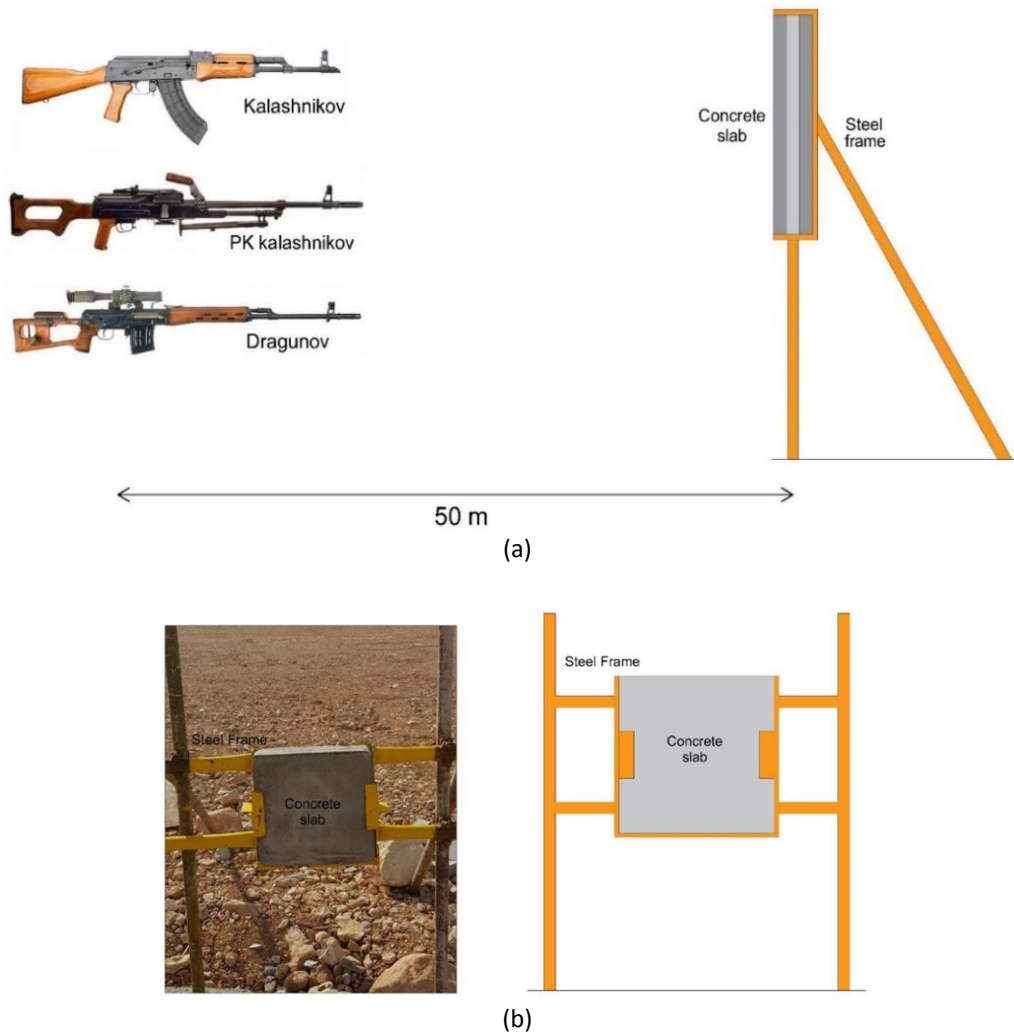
Projectile impact test: (a) Lateral view (b) Front view
